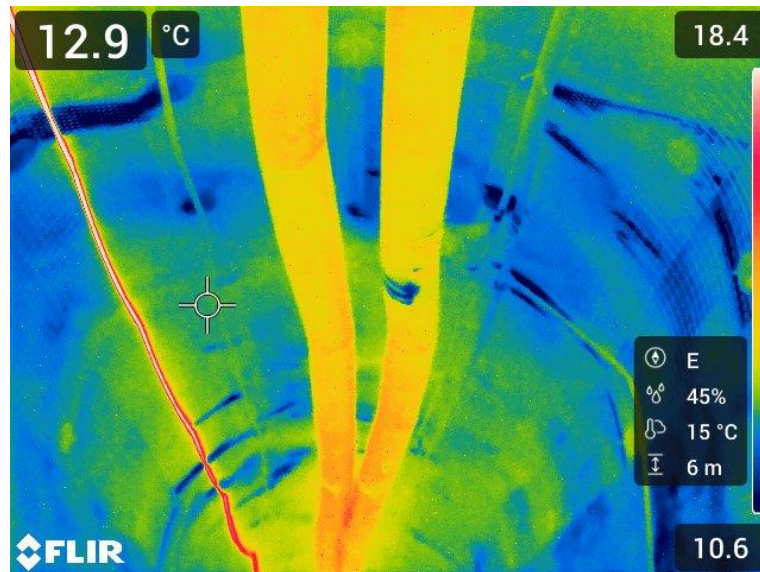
IR-image of the roof at the deposition tunnel 5-1 (DT5-1). The roof is covered with metal net. 16.12.2022.
